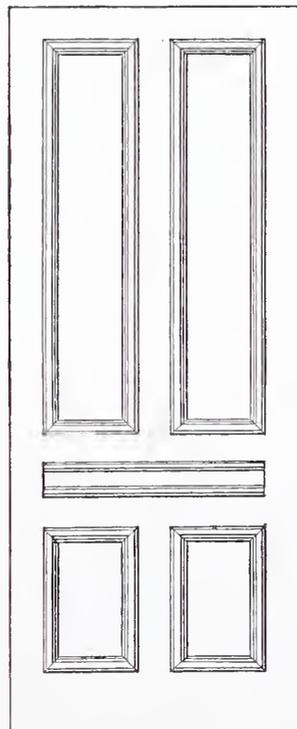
Elevation of Inside Doors.—Scale, 1/2 Inch to the Foot.
